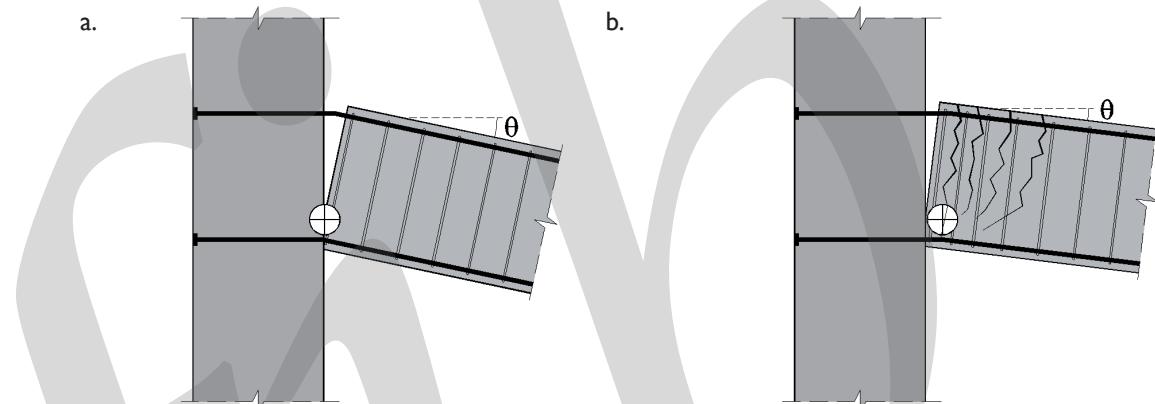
Deformation and crack configurations in beam-to-column connection without corbel
